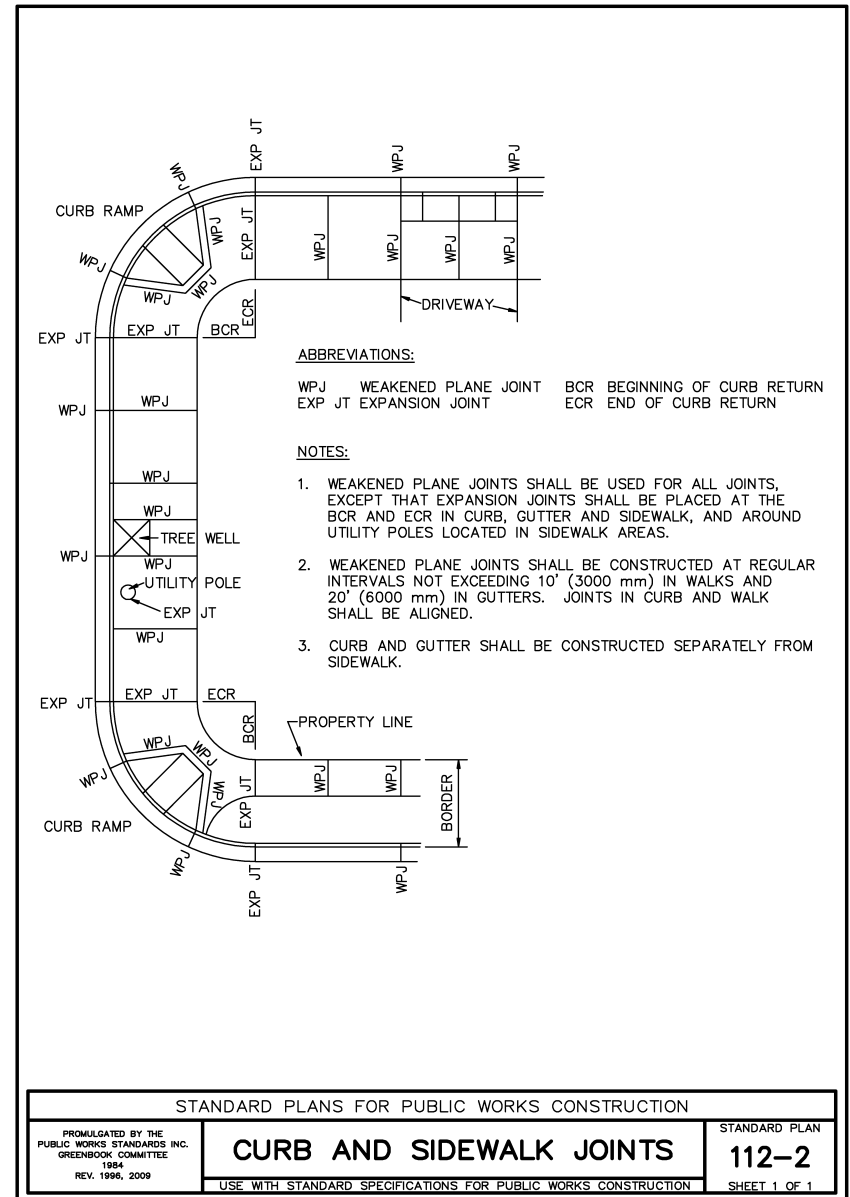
Greenbook Standard Plans for Public Works Construction
